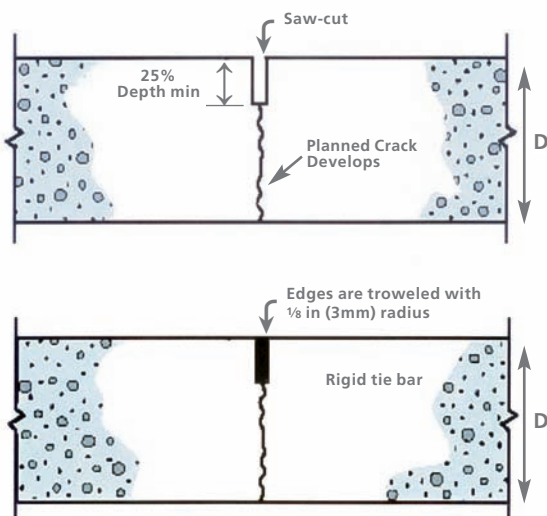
shows reinforced construction joints. It is important to remember that all construction joint designs have the potential to become contraction joints and to lose adhesion at the butt joint connection.
